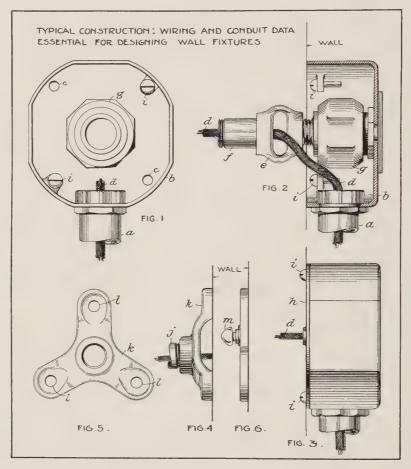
Wiring and Conduit Data for Wall Fixture.
